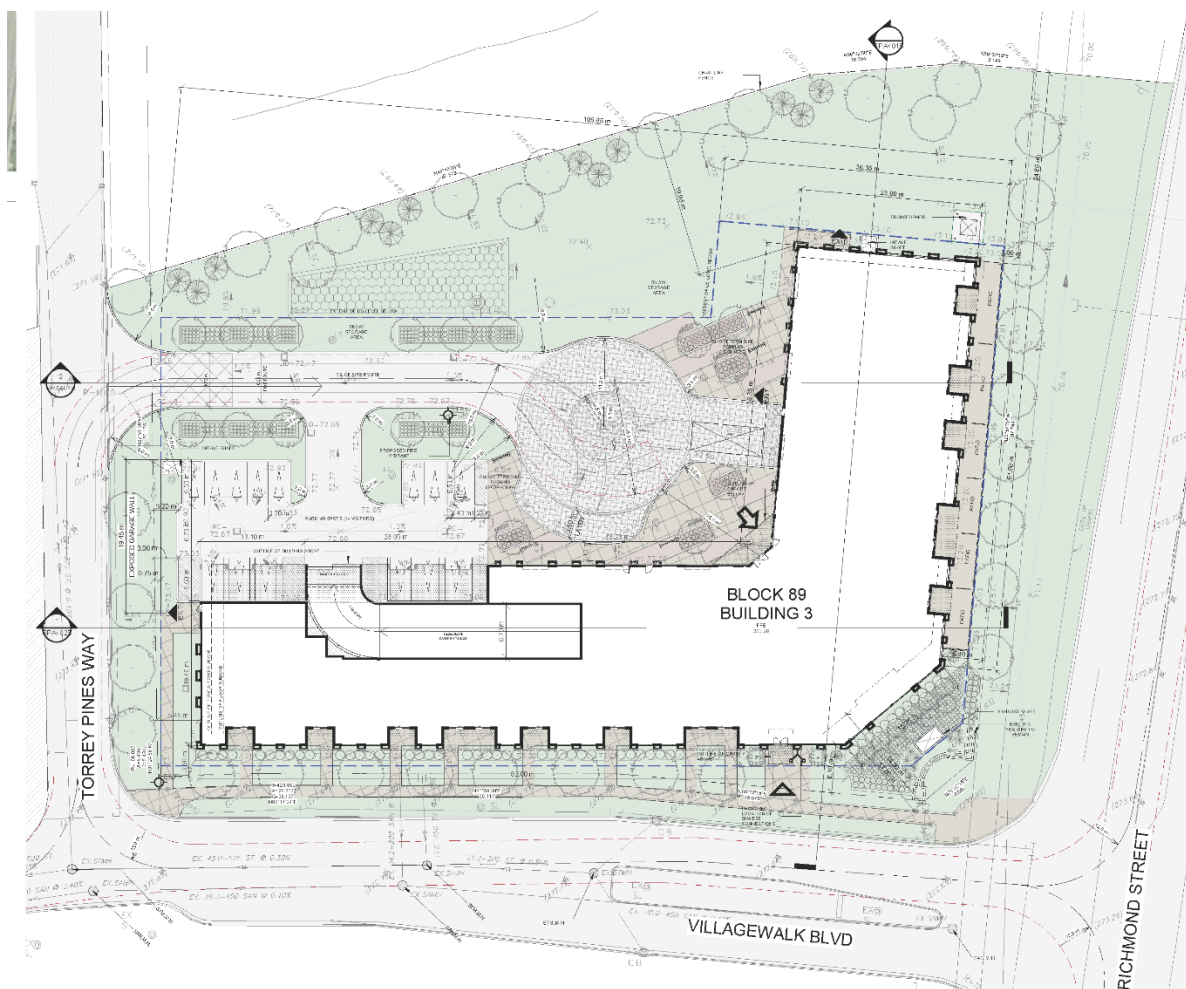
Conceptual Site Plan (30 Villagewalk Boulevard (September 2023))
